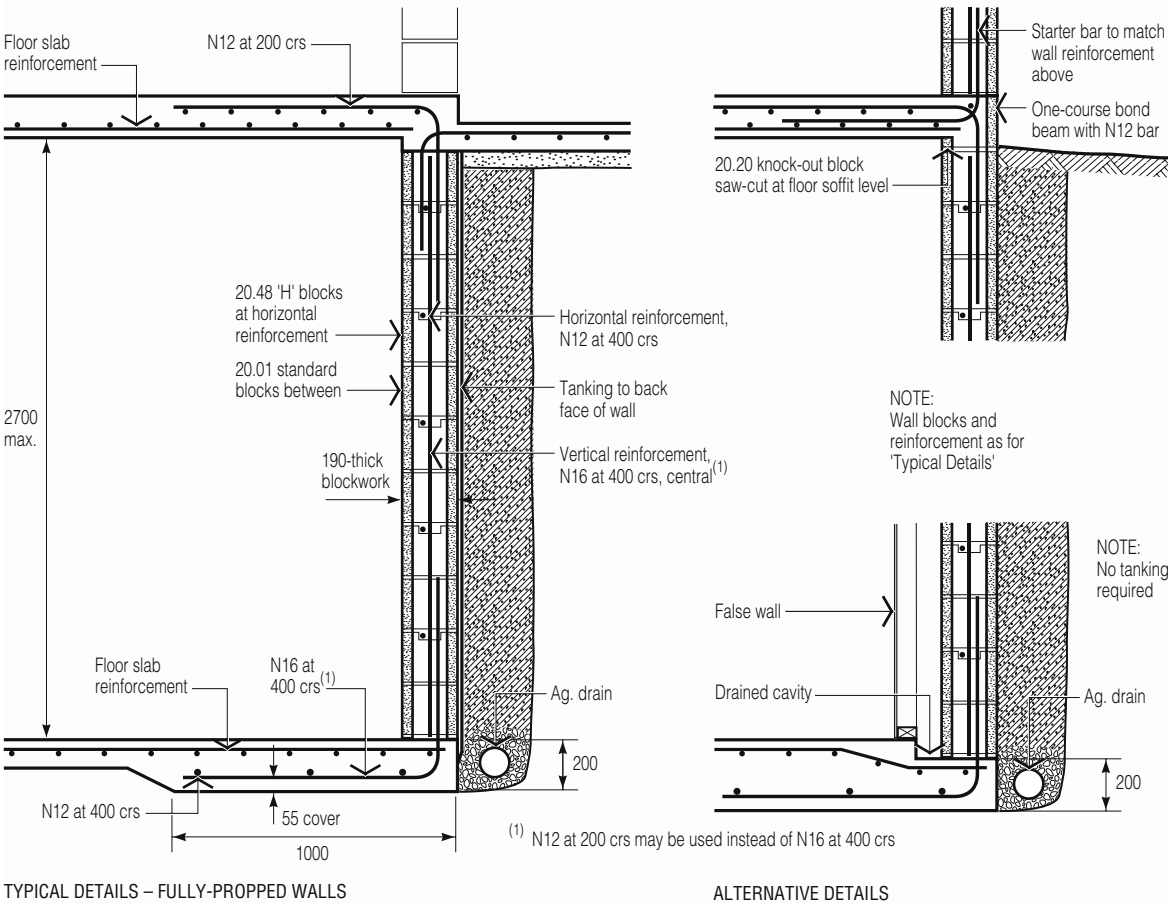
Typical Basement Wall Supporting a Concrete Floor
